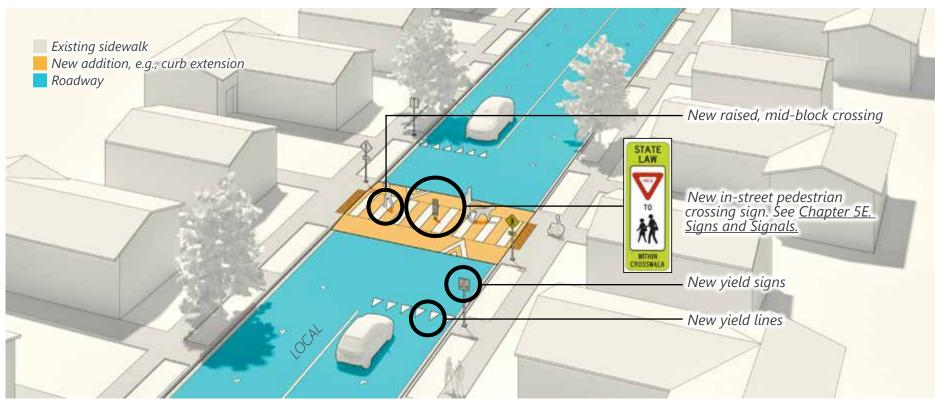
New Mid-Block Crossing, Raised Crosswalk, and In-Street Pedestrian Crossing Sign across a Local Street.
